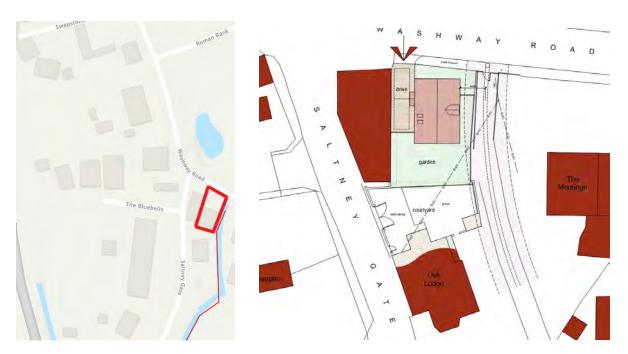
Location Plan (left) and Proposed Site Plan (right). The Board's Scarlet Gate Drain is to the East of the property.
